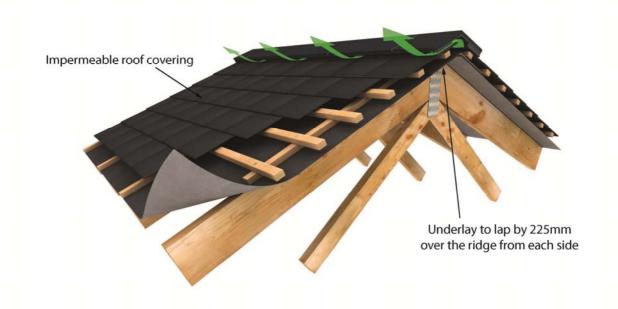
Cold Roof detail with impermeable roof covering - Ridge Detail
